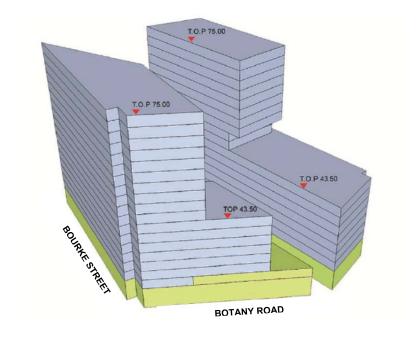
Proposed Building Envelopes – Corner Botany Road and Bourke Street
